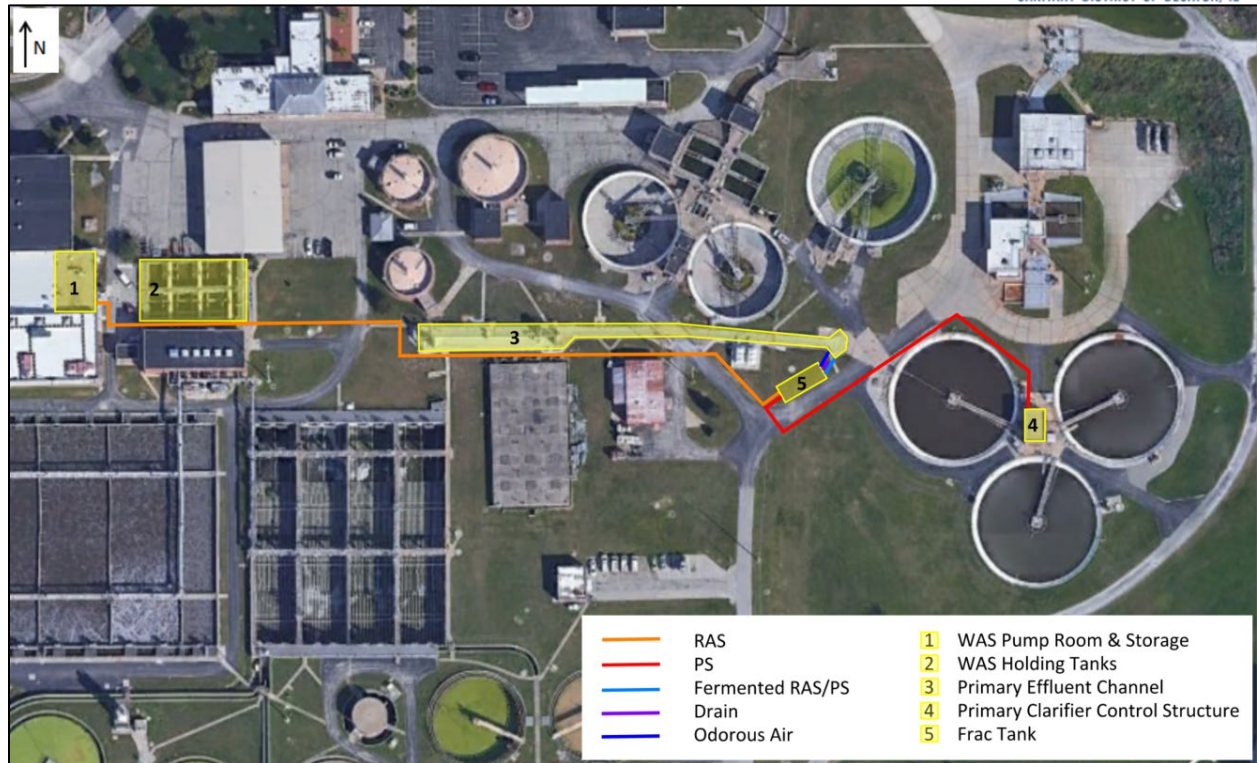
Preliminary Site Plan for Frac Tank Pilot Project
